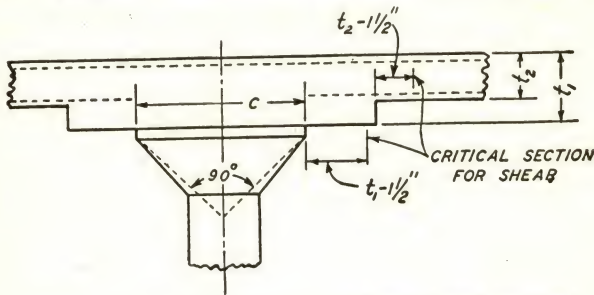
Typical Column Capital and Sections of Flat Slab, with Dropped Panel
